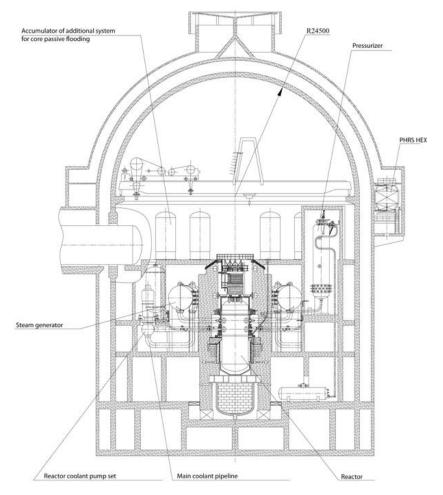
Layout of RP V-448 equipment (longitudinal section)
